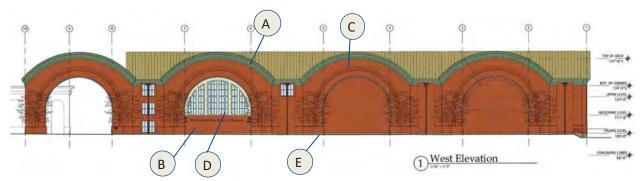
Excerpted from the 2002 brick veneer water repellent project this drawing of the West Elevation of the building shows an overview of the typical cladding systems. It was been colorized to clearly delineate the various building envelope systems at the Museum. Components are named as follows: A. Sheet Metal Cornice, B. Brick Veneer Cladding, C. Decorative Aluminum Panel Cladding, D. Aluminum Storefront Window Assemblies, E. Pre-cast Concrete Plinth.
